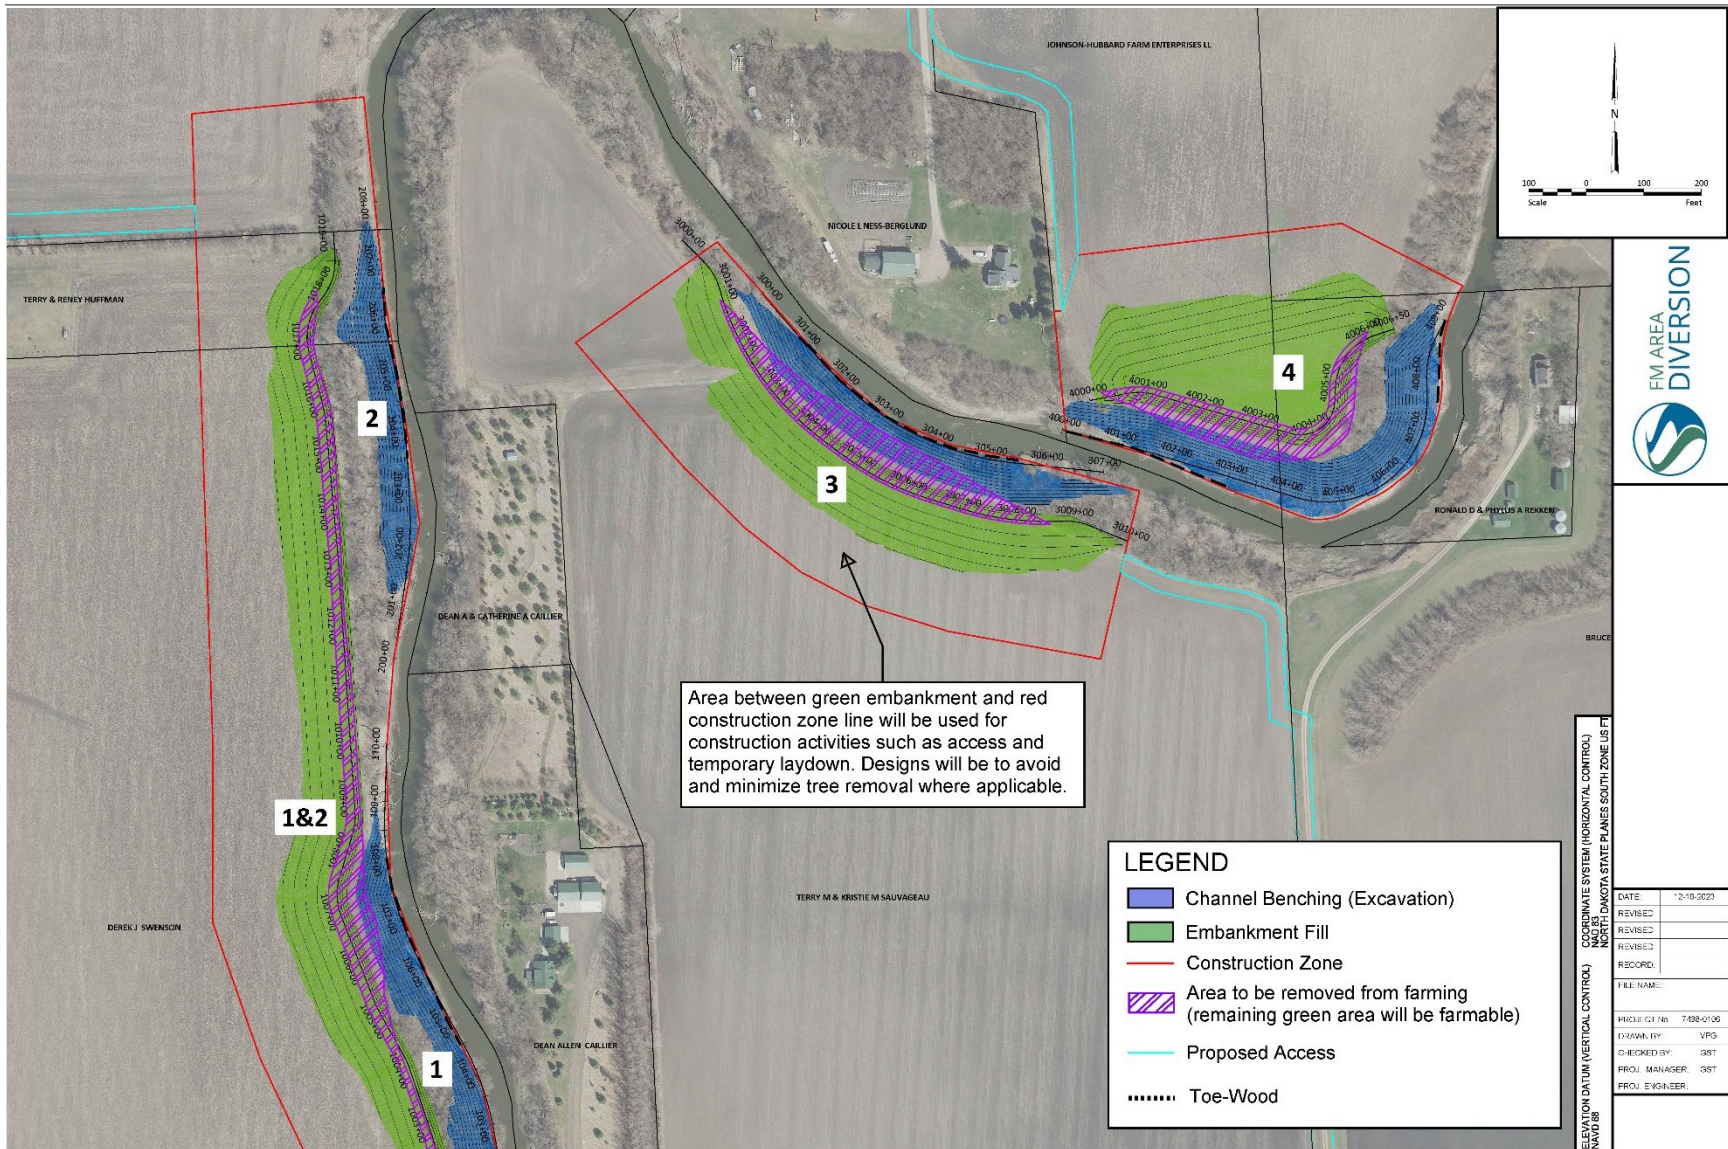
Sheyenne River Proposed Alternative Benching Detail (Figure 3 of 4)
